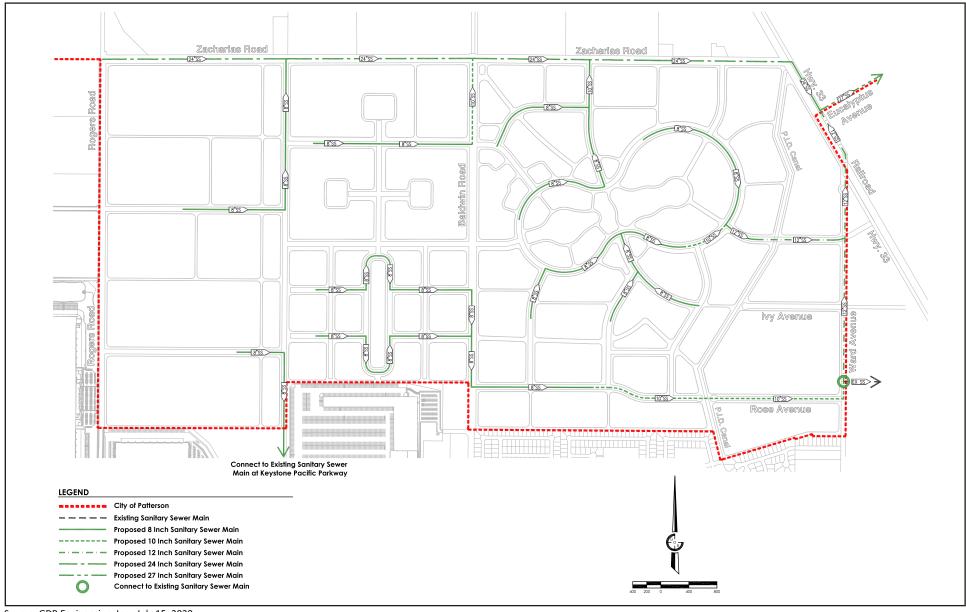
Zacharias Master Plan Sanitary Sewer Plan – North Patterson Trunk Sewer
